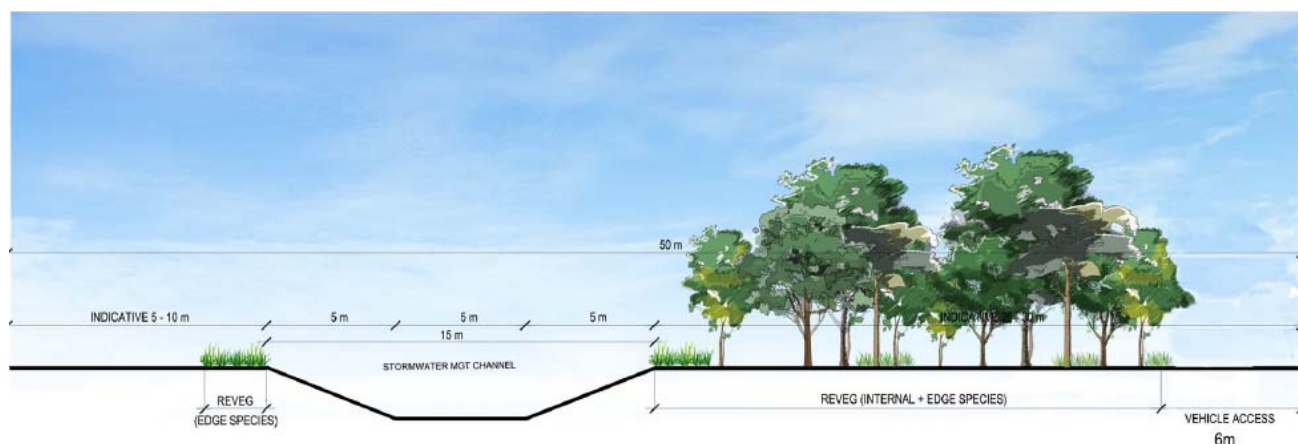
Typical cross-section of the east-west fauna corridor through Precinct 6
